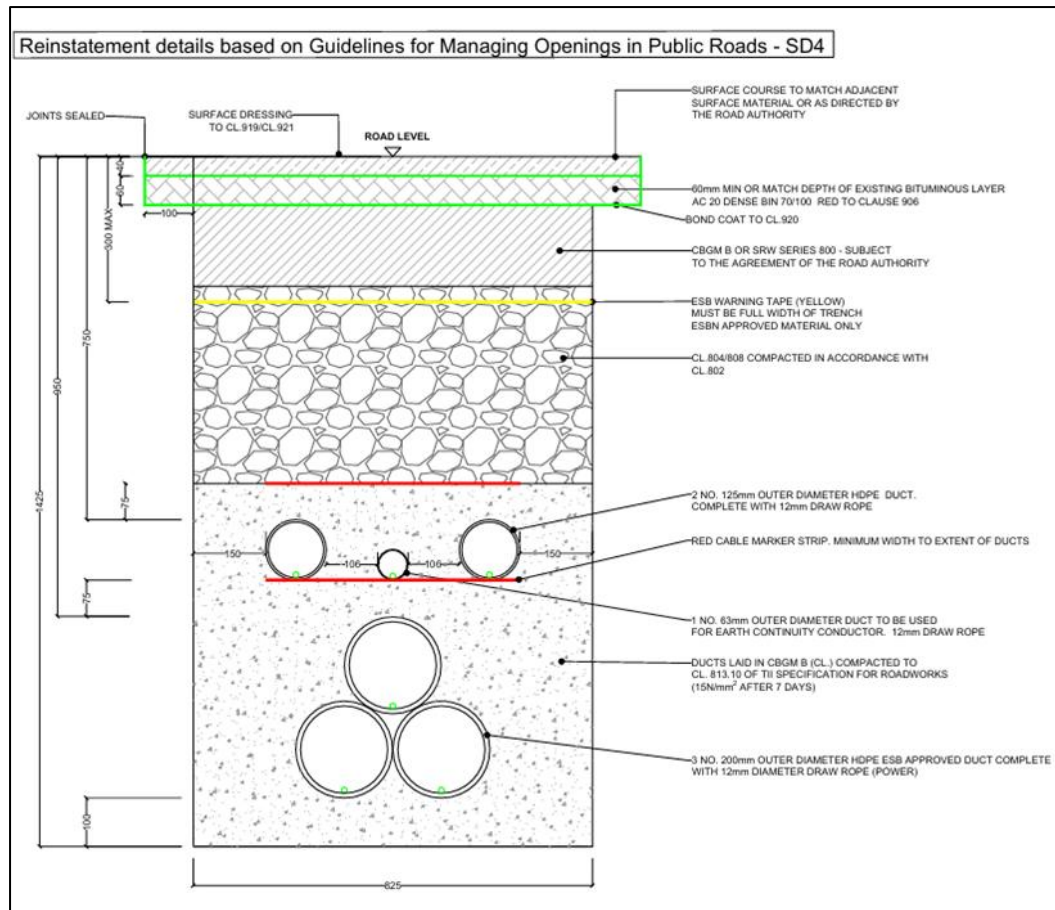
Typical Installation in Roadway for 220kV UGC Grid Connection
